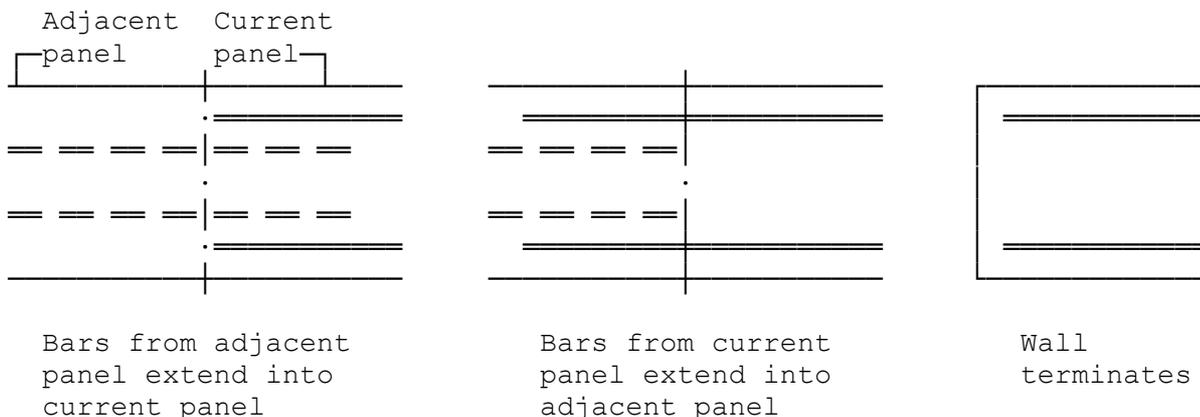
(a) - PLAN ON LEFT HAND END OF WALL PANEL
